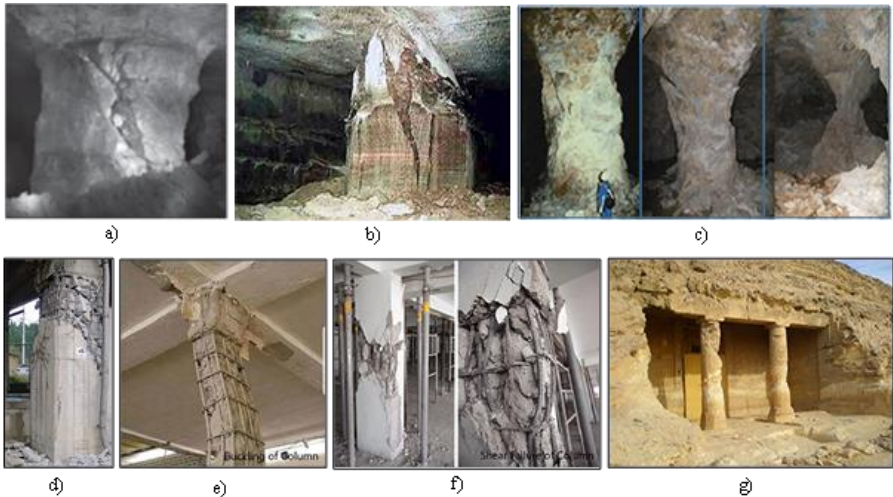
Failures at column-like load carrying structural elements; a) Fractured underground mine pillar (Esterhuizen, et al., 2011), b) Pillar failure, Cleveland ,US, (Photo by Franks, A.M. & information by Coleman, T.) (ECIA, 2023), c) Progressive spalling of a gypsum mine pillar (Photos from 1996, 2000, 2004), (Sorgi & Gennaro, 2011; Sorgi & Watelet, 2007), d) Failure due to compressive stress at a reinforced building column (Structural guide, 2023), e) Buckling failure at reinforced building column (Structural guide, 2023), f) Shear failure at reinforced building
